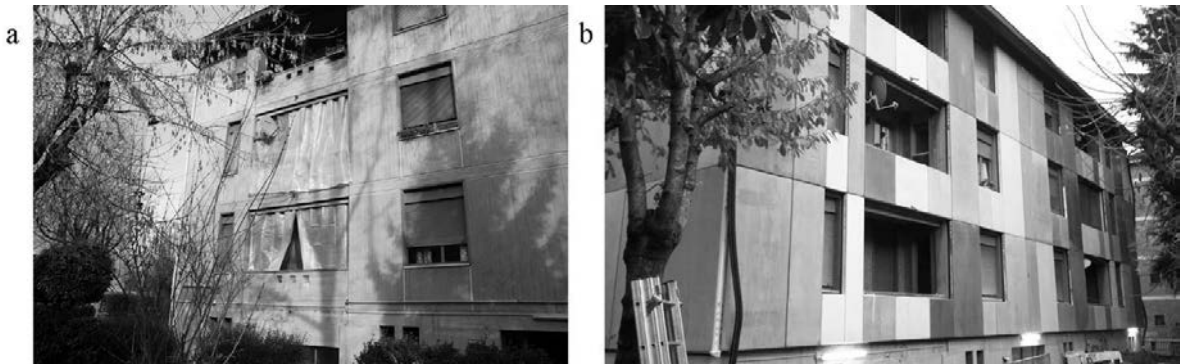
a) the south façade before the recladding; b) the south façade after the installation of the prefabricated insulated panels.
